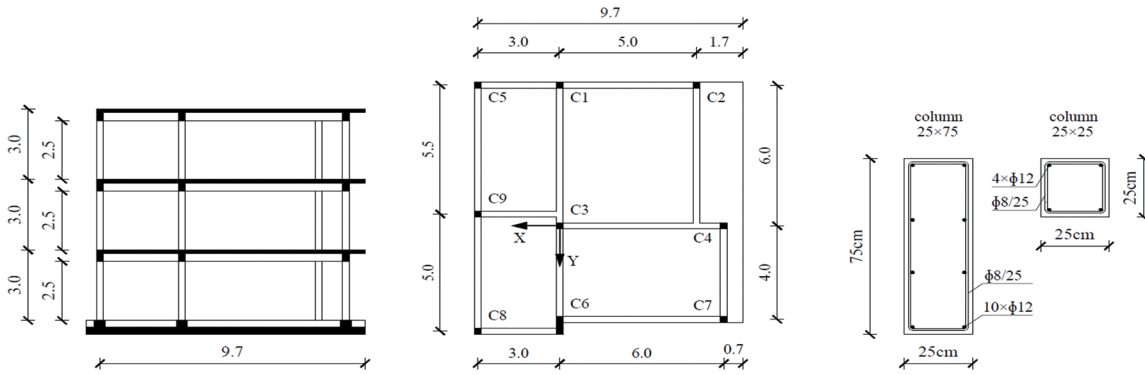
The elevation view, the plan view and the typical reinforcement in RC columns of the SPEAR building.
